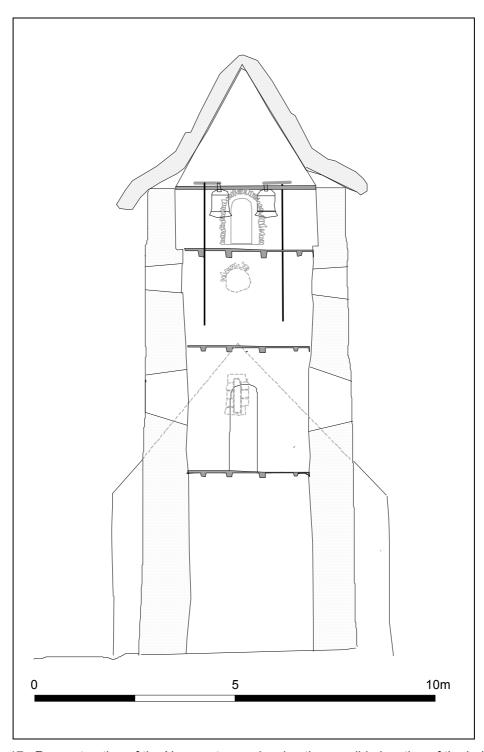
Reconstruction of the Norman tower showing the possible location of the bells and second floor ringing chamber. (after Everson and Stocker, 2006)
